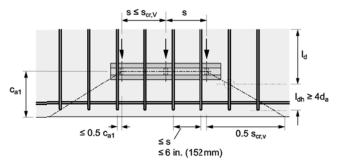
REQUIREMENTS FOR DETAILING OF ANCHOR REINFORCEMENT OF ANCHOR CHANNELS
